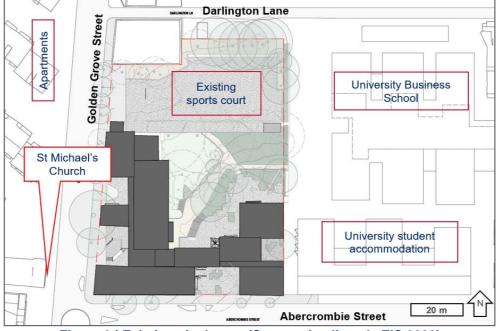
| Existing site layout (Source: Applicant's EIS 2020)
